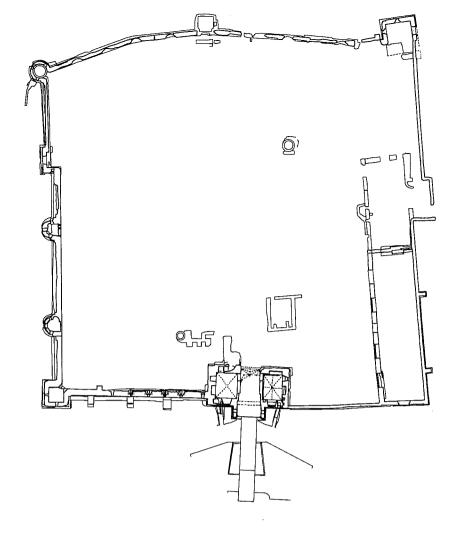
Baconsthorpe Castle, Norfolk. Plan of inner court ruined walls at best surviving height, showing control network to position REDM for tracing the plan.
